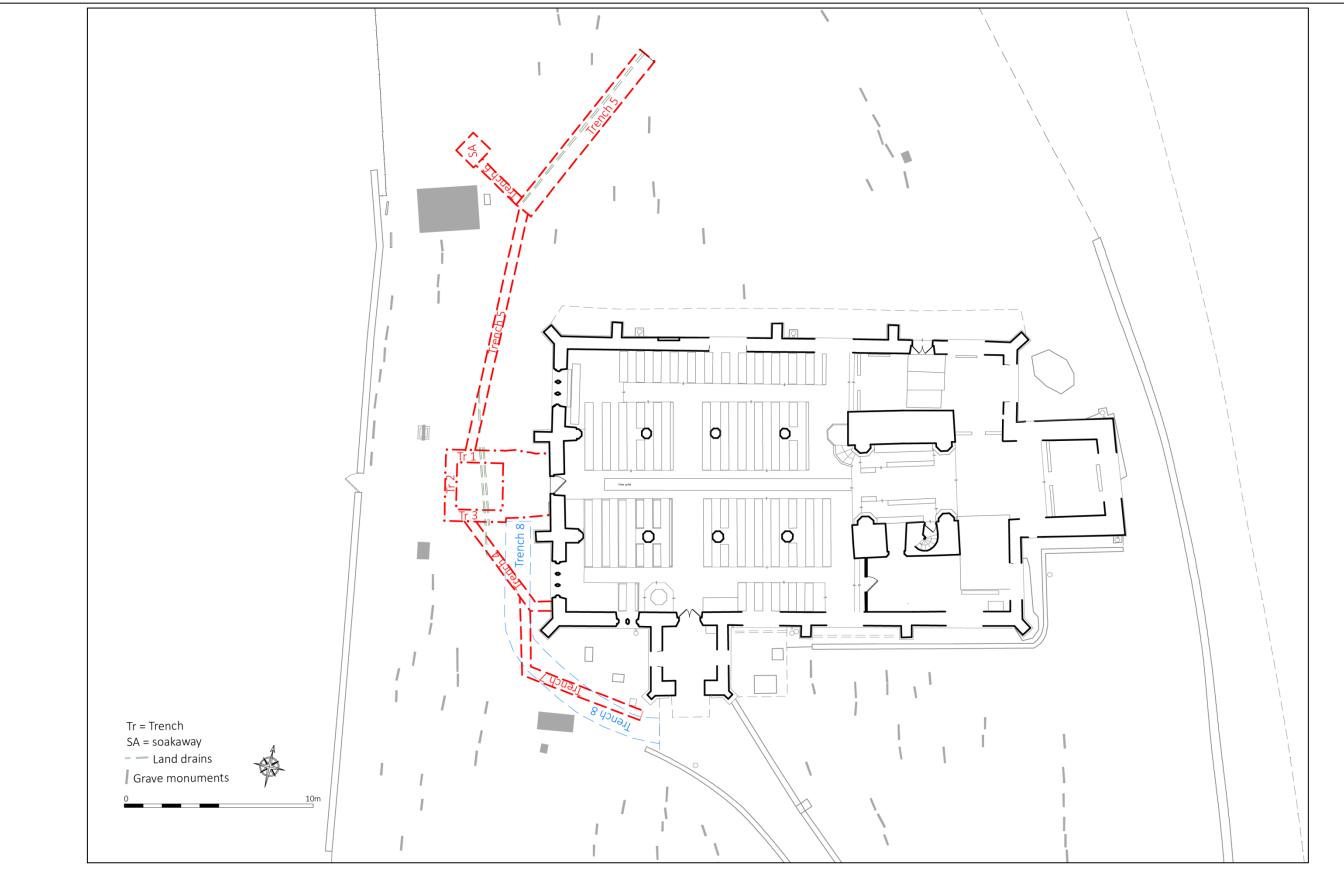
Trench plan at the parish church of St Mary, Great Brickhill (scale 1: 200)
